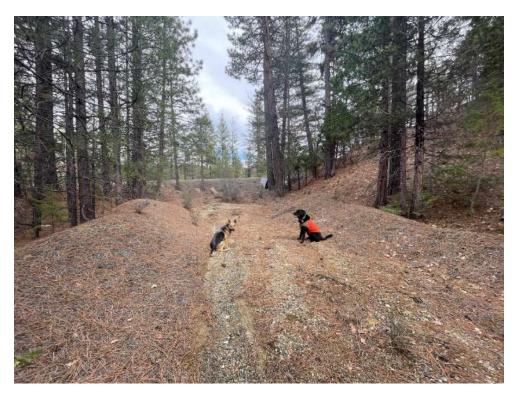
EFG 24 downstream of bypassed culvert. April 5, 2024.
